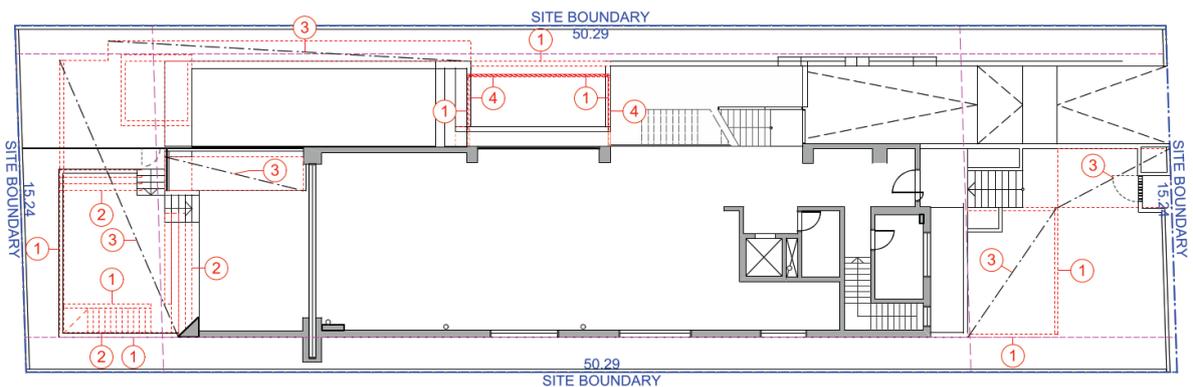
Extract of the proposed demolition plan – ground level (source: AE Design Studio).
